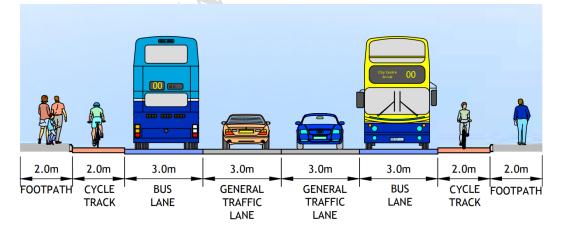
Cross-Section B-B (relevant to RG1, RG3 & RG5)
